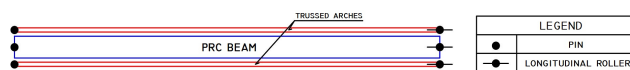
Plan view scheme of the external boundary assigned to each structural element.
